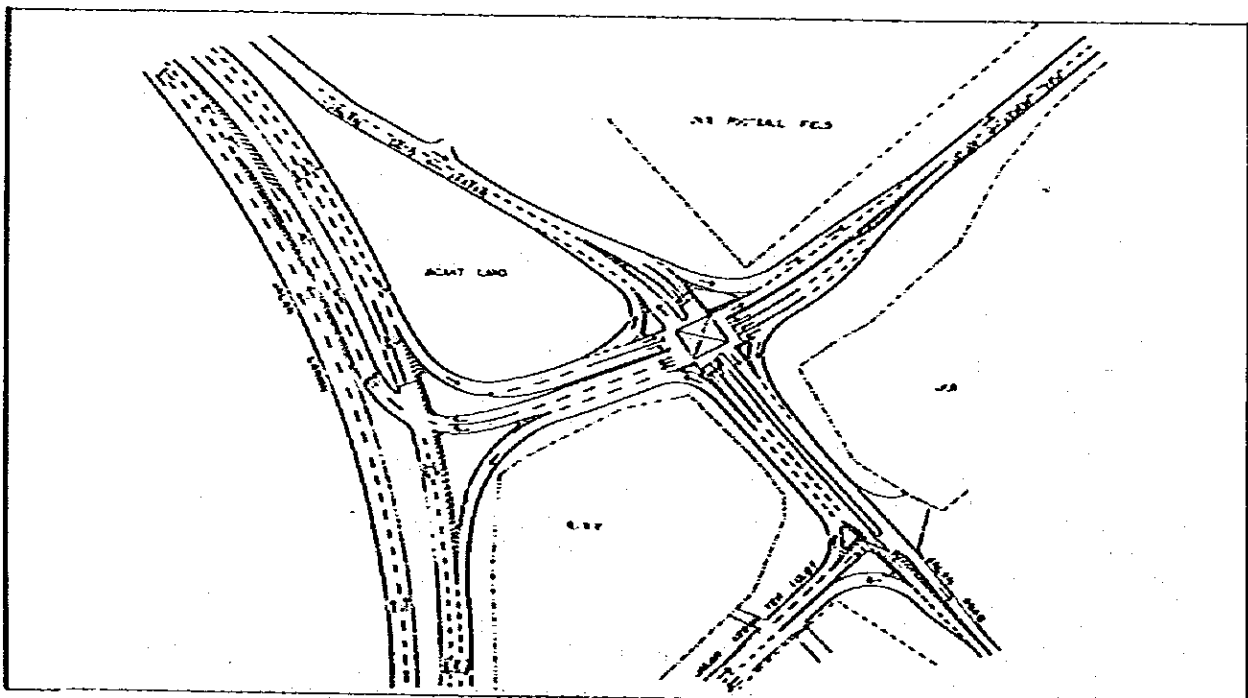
PROPOSED INTERSECTION IMPROVEMENT PLAN (IMMEDIATE ACTIONS)
